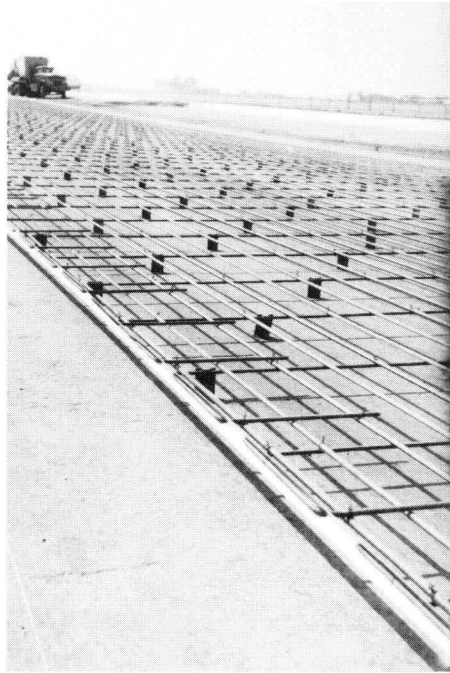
DEFORMED BAR CONTINUOUS REINFORCING STEEL IN PLACE AHEAD OF PAVING TRAIN SHOWING DESIGN AND ARRANGEMENT OF STEEL FOR ATTACHMENT OF APPROACH AND ACCELERATION LANE TO MAIN PAVEMENT IN LEFT FOREGROUND.
